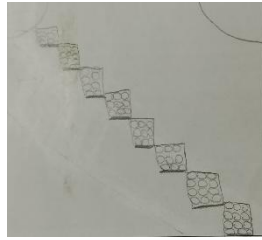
Project for constructing sunlit staircases from transparent glass and drying fruits within them.
